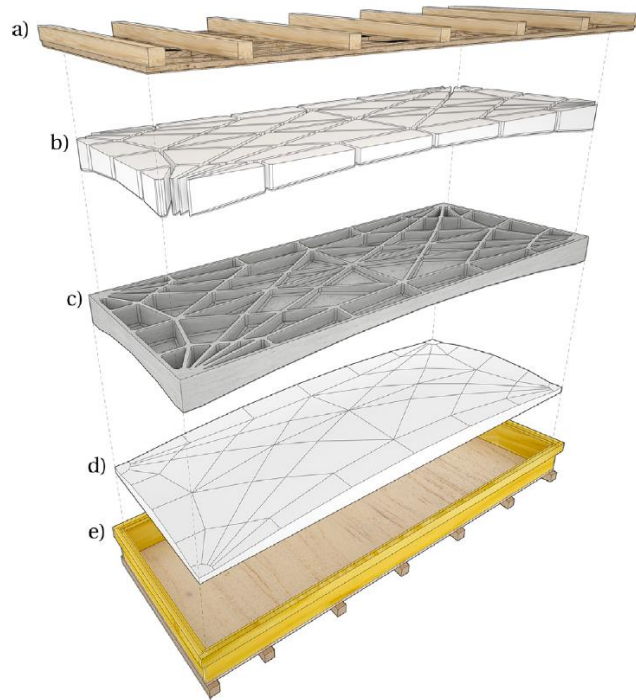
Concrete formwork; a) CNC-milled wooden cover frame, b) arrangement of wire-cut foam blocks for the voids and rib formation, c) concrete floor, d) base layer of CNC-milled foam blocks forming doubly-curved vault, e) supporting wooden case (Liew et al. 2017)
